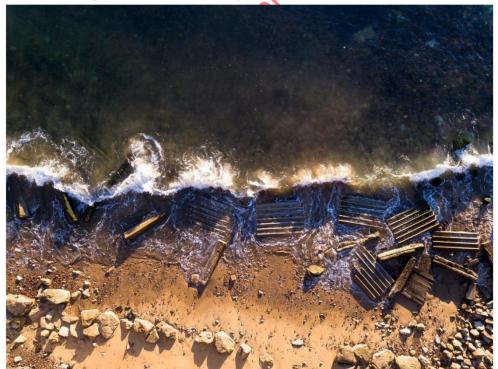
Terrigal beach erosion and exposed former sea wall (aerial view). Source: www.centralcoastdrones.com.au
